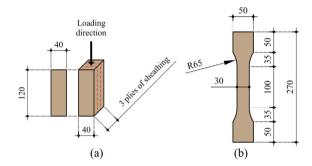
Sheathing materials testing: (a) compressive coupon [29], (b) tensile coupon [11] (unit - mm).
